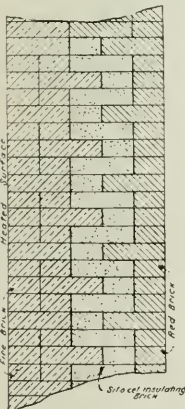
TYPICAL WALL CONSTRUCTION WITH SILOCEL BRICK LAID IN WALL
